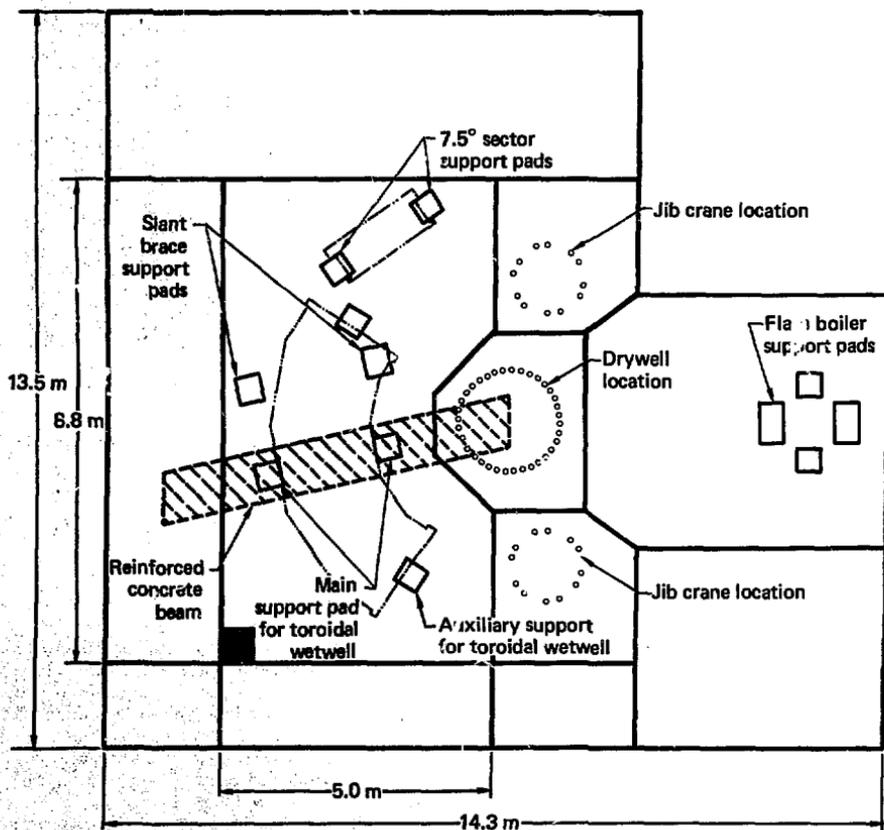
Plan view of the 1/5-scale pressure suppression experiment facility test pad.
